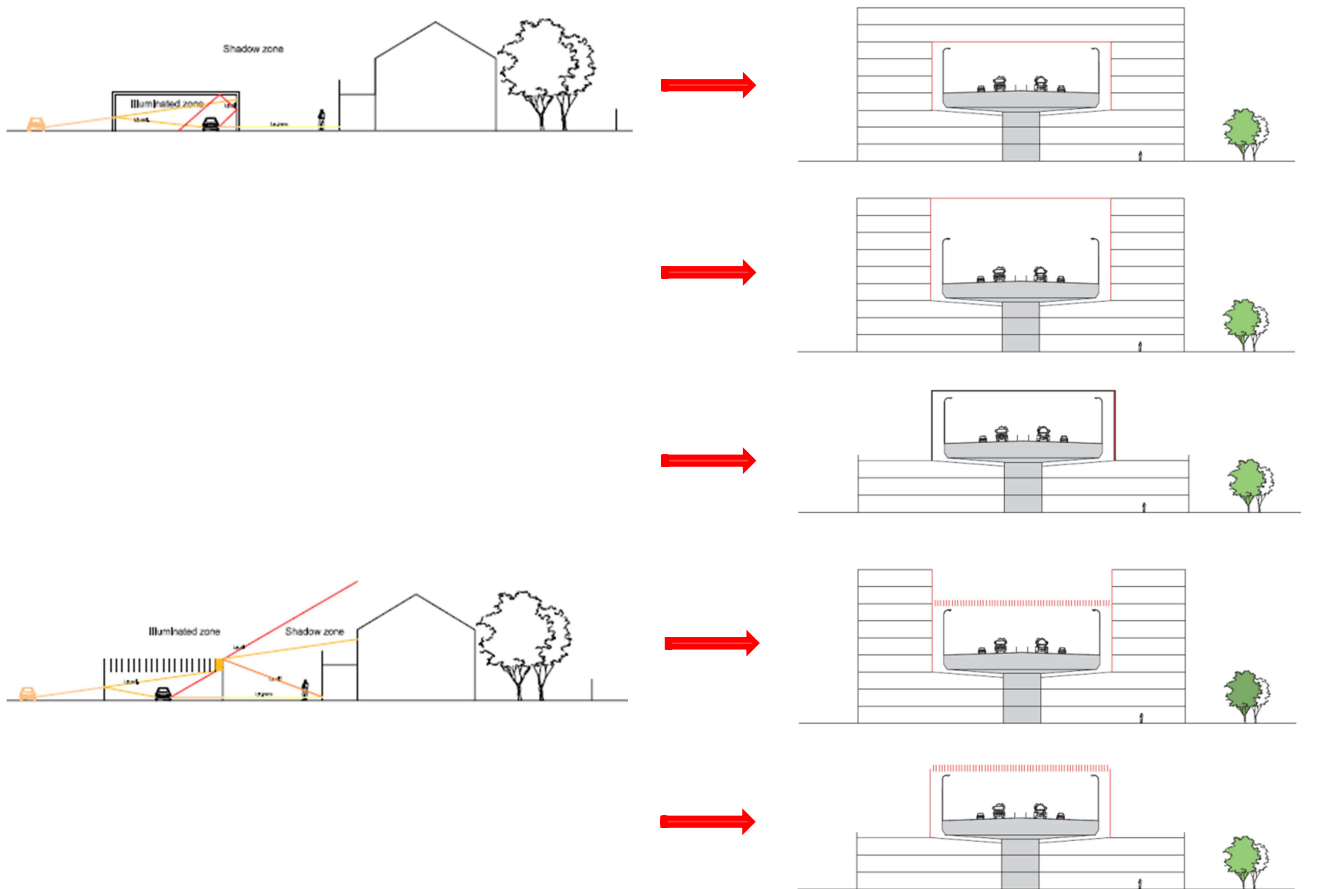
Tunnel principles translated to building design at the A5(Author,2013)
